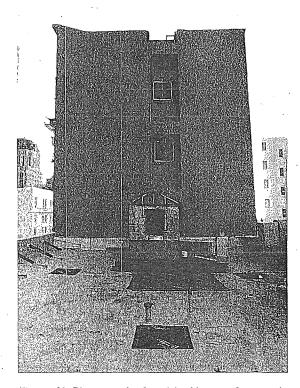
Photograph of roof, looking south towards elevator penthouse and adjacent building (photograph taken on 02/27/2018).
